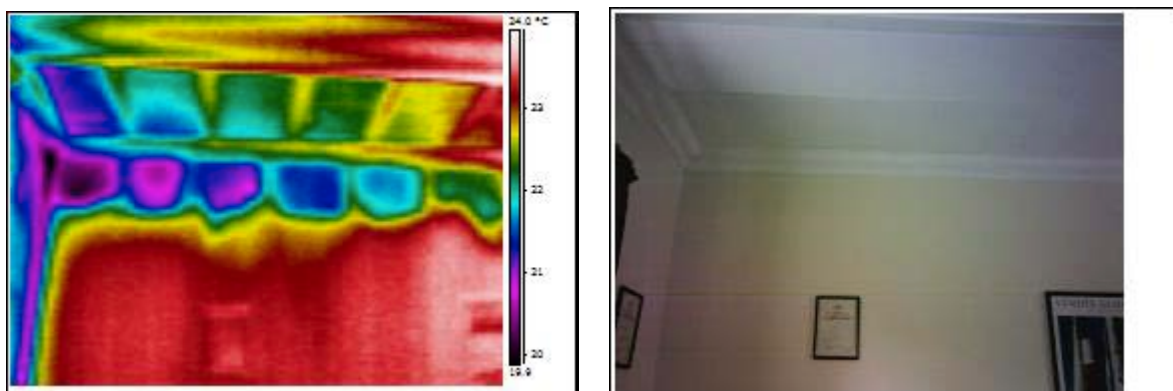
Room F21. The image shows thermal anomalies at the wall-roof junction in room F21 at first floor. It is likely to be due to the build process of recent roof installation.
